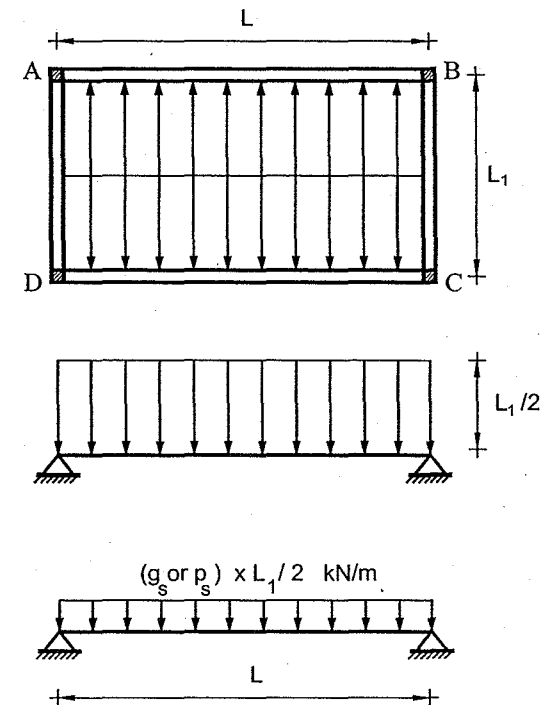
Loads on beams supporting one-way slabs  $L/L_1 > 2$
